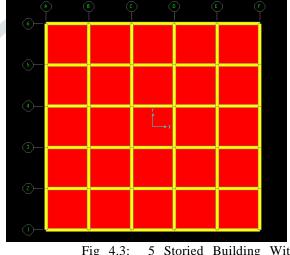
5 Storied Building Without Water Tank – Plan View
